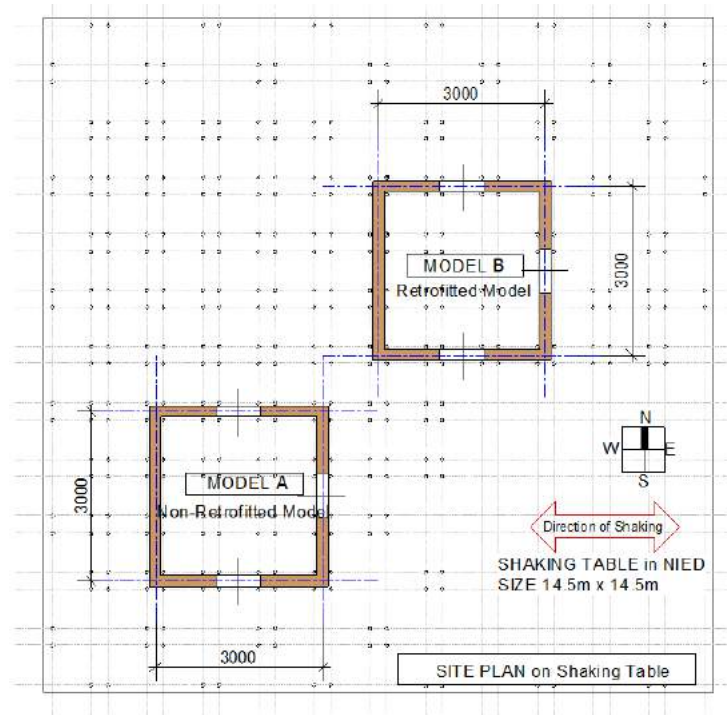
Two models for the shaking table test: Model A: original unreinforced mud mortar stone masonry without plaster; Model B: unreinforced mud mortar stone masonry strengthened by wrapping 2mm gabion wire mesh on both sides of the walls.
